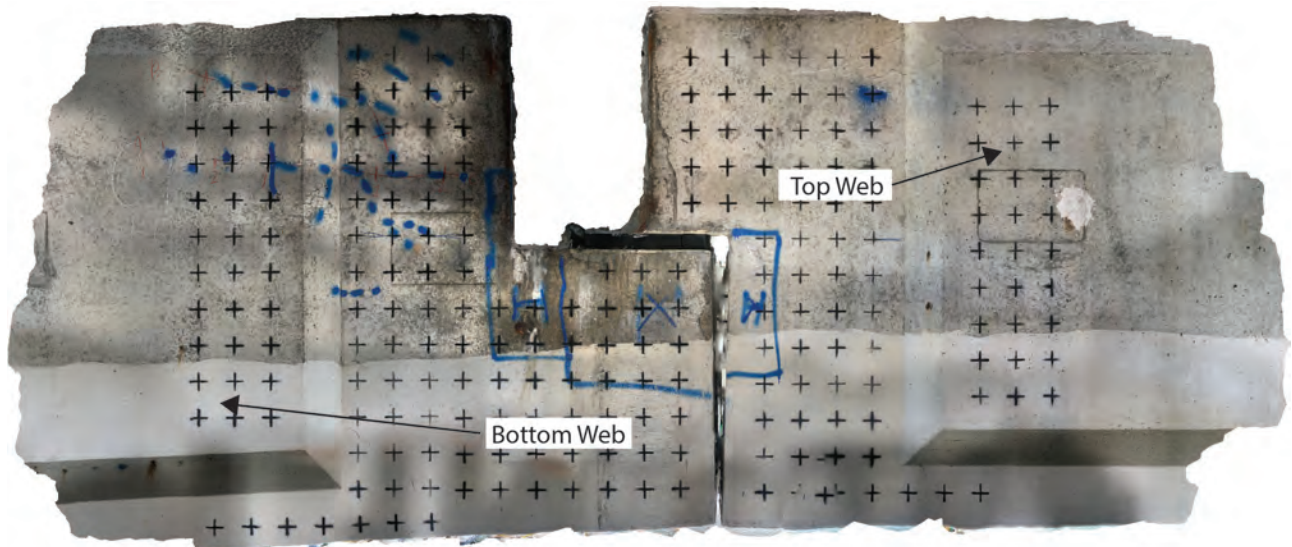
Digital photogrammetry example Image for bridge girders with 6 in (150 mm) NDE grid marked out on girder webs and ends (note 3D-like depth effect in image)
